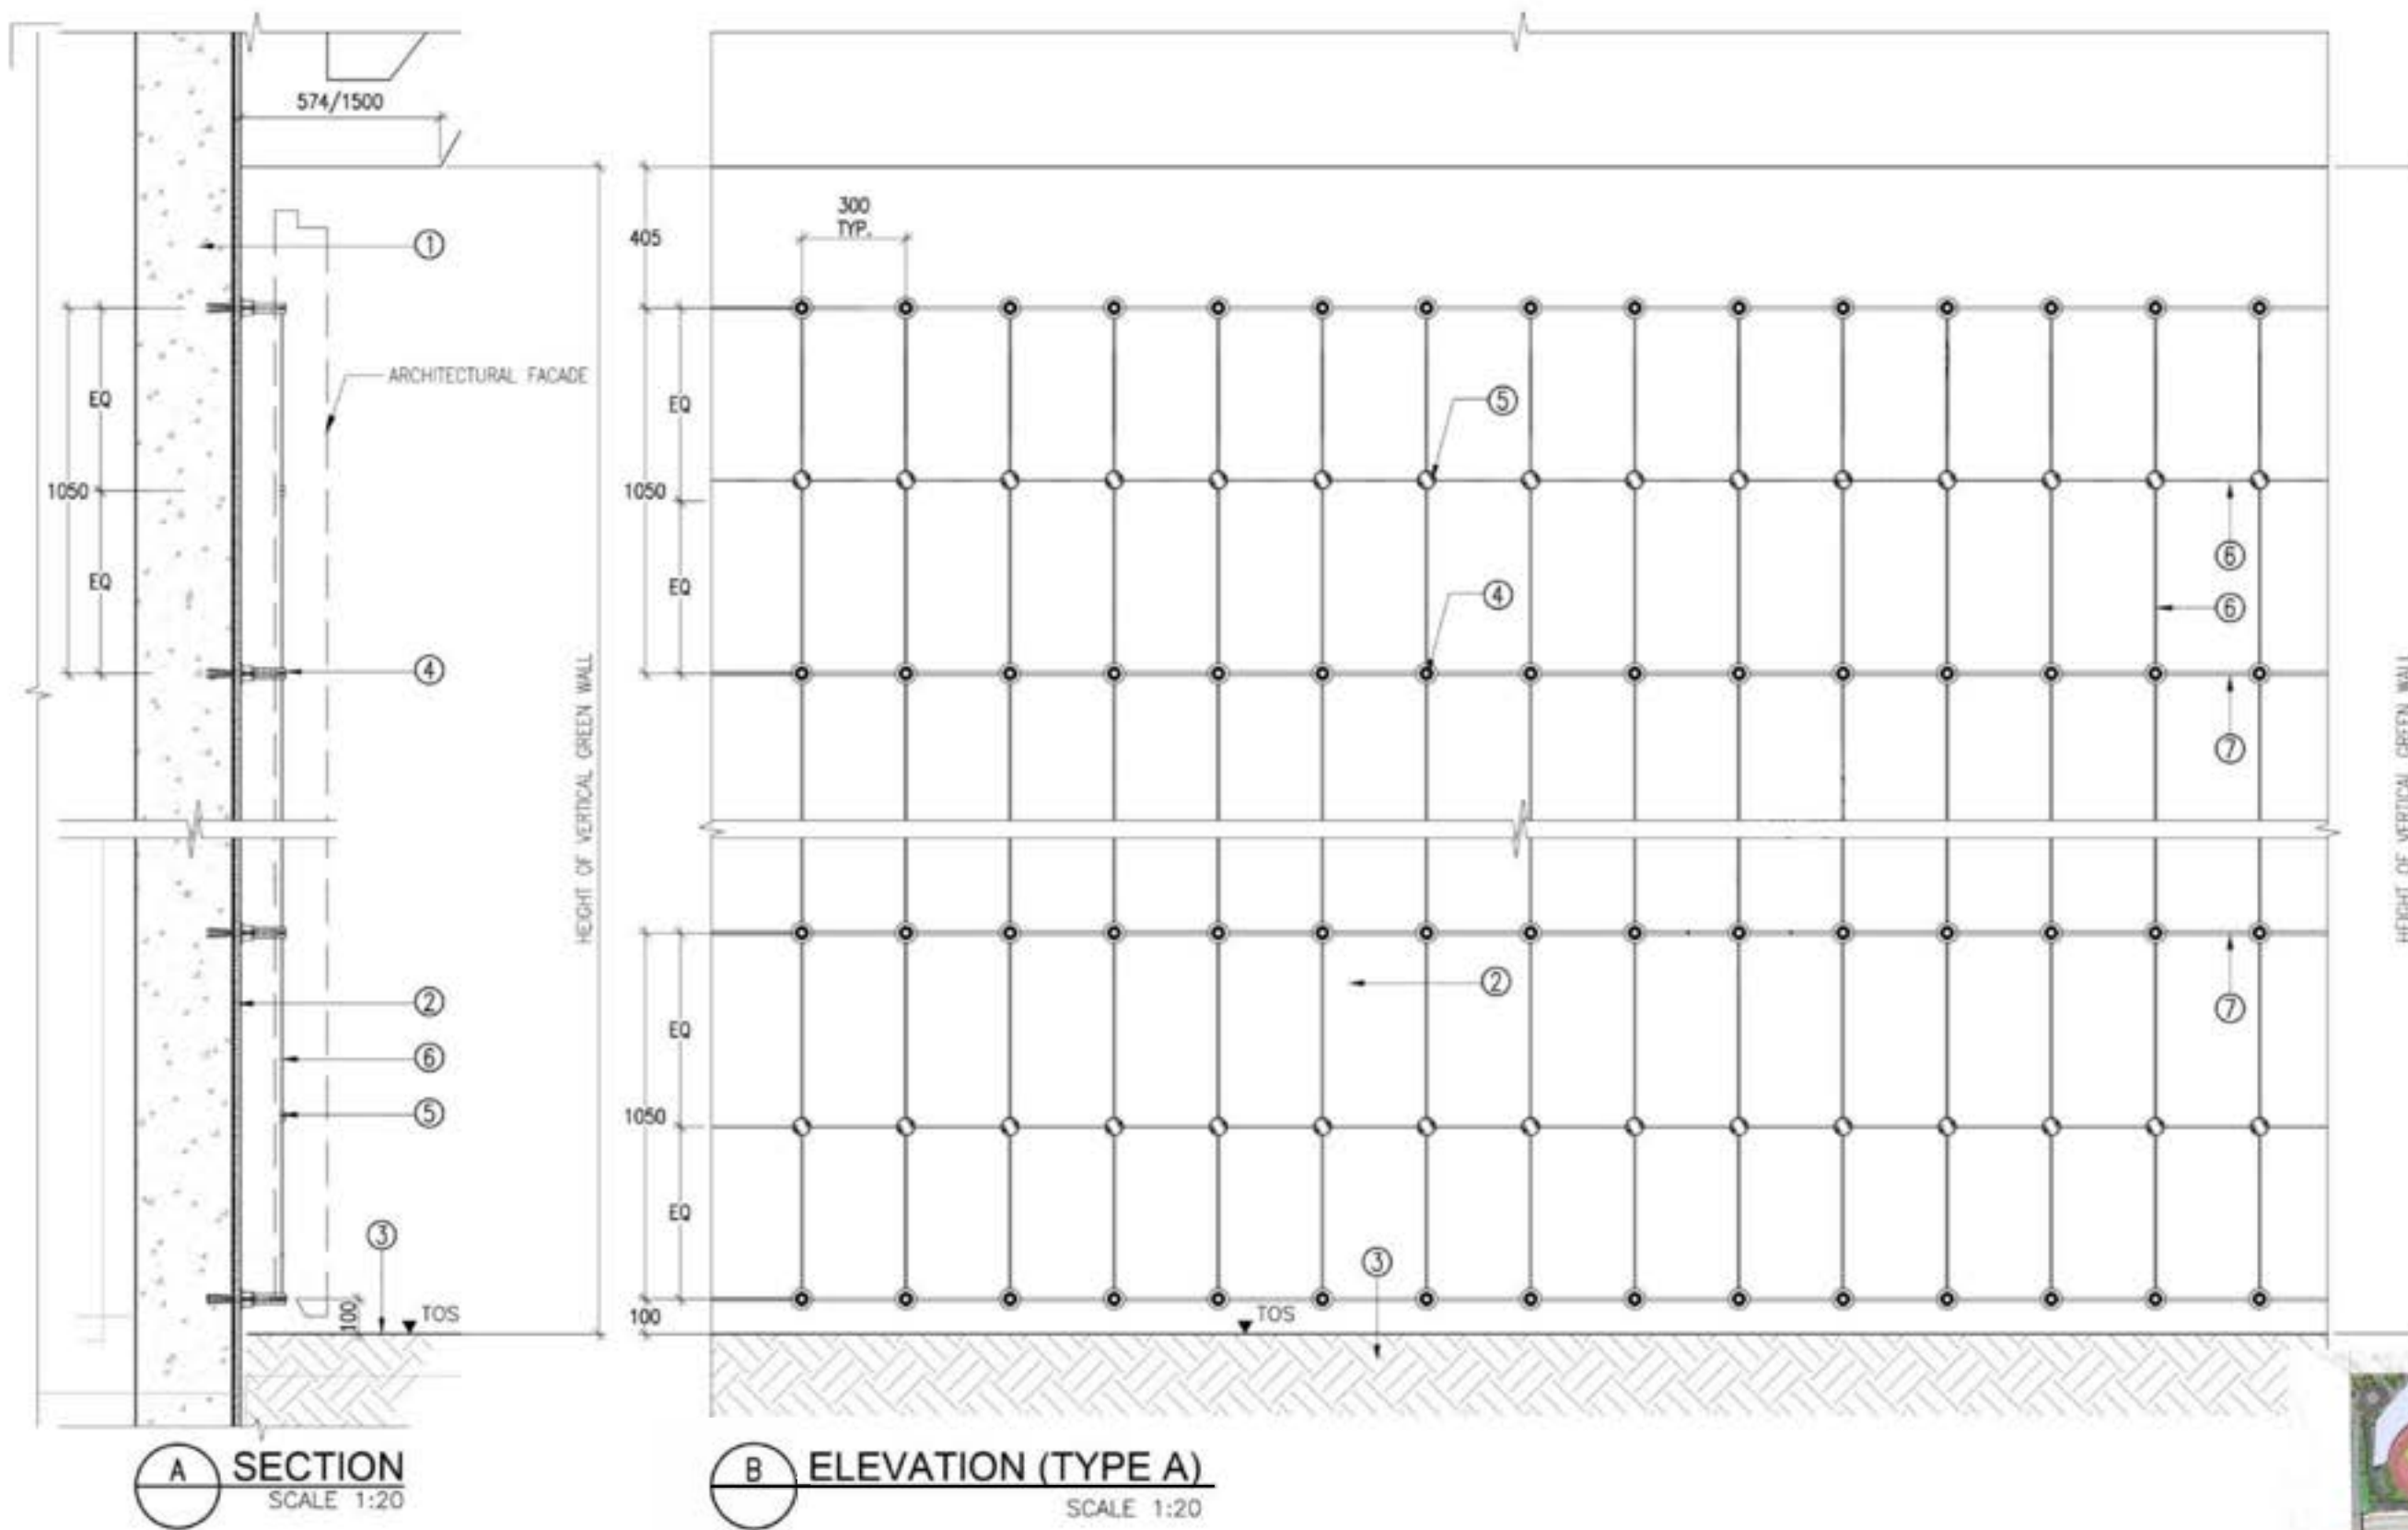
Vertical Greening Typical Details: Façade Modular System
